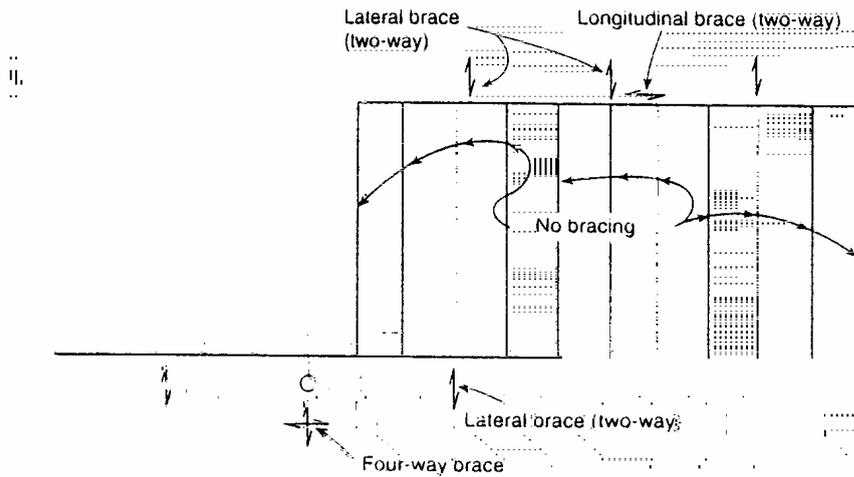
(d) Typical location of bracing on a looped system.
